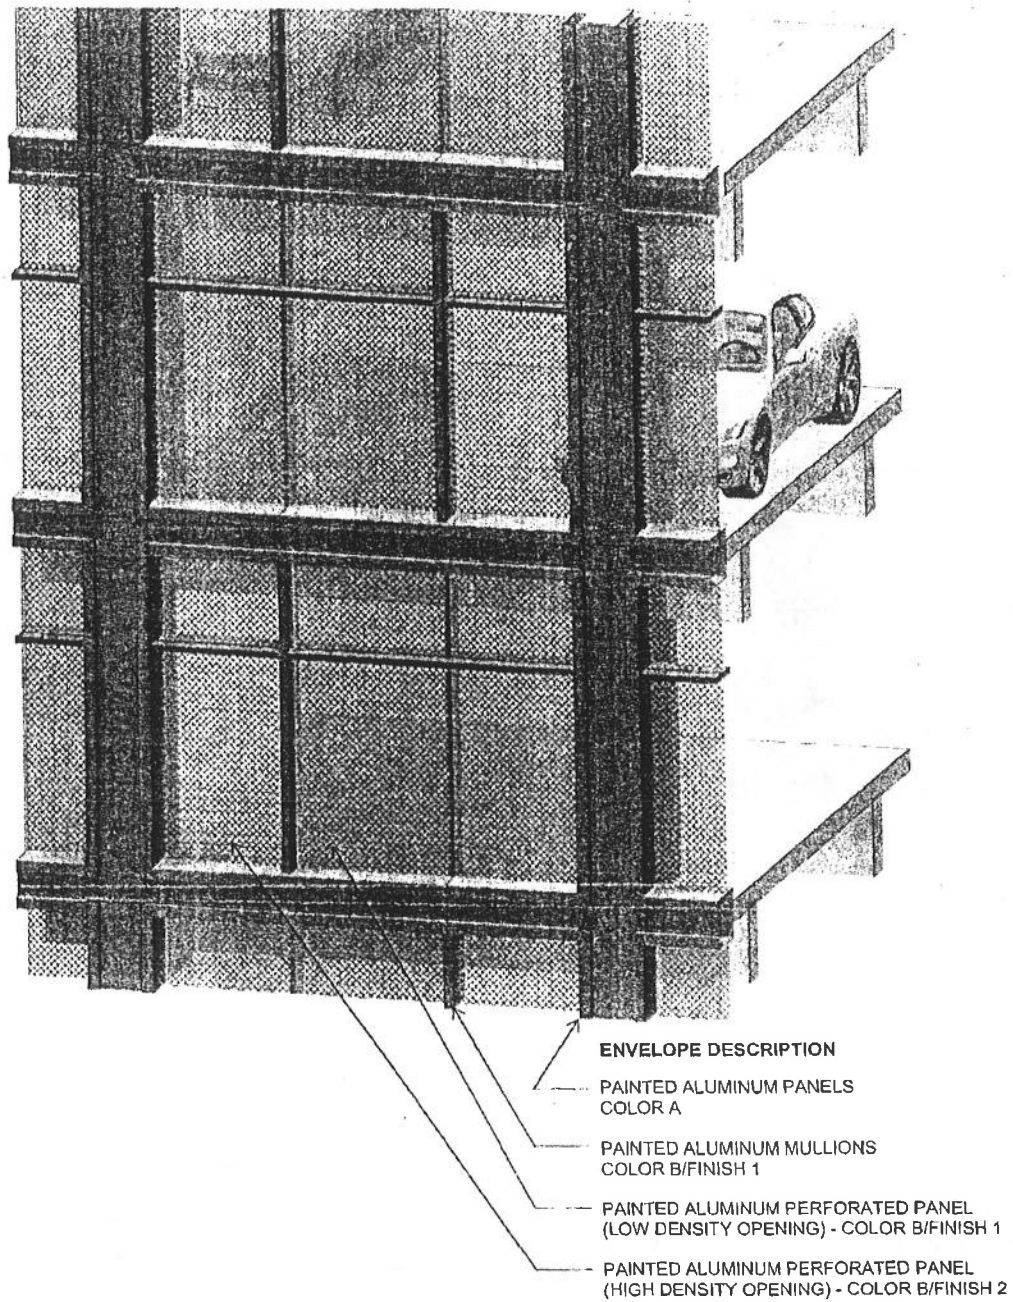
C: TYPICAL BAY @ GARAGE- DETAIL
